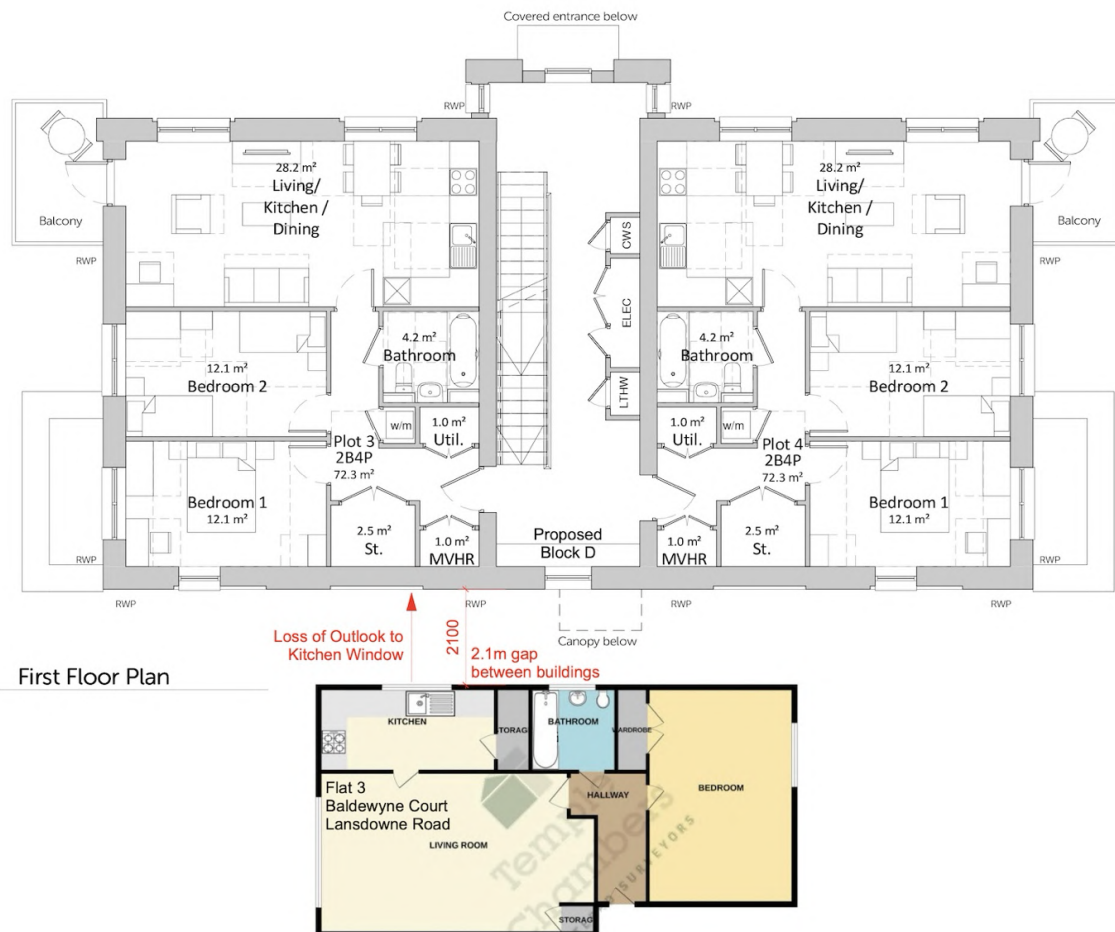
An annotated extract of the first floor plan illustrating the loss of outlook to existing kitchen window at Flat 3 Baldewyne Court where Block D is proposed to be built only 2.1m away.
